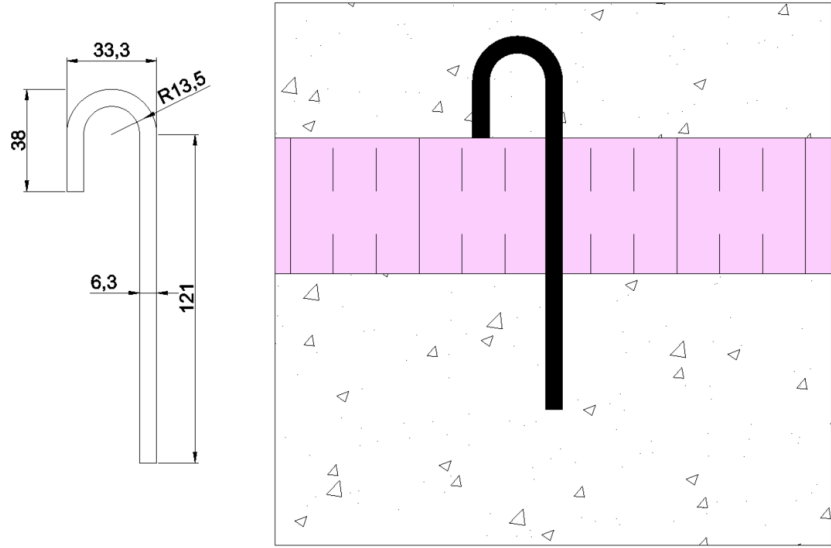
Shear Tie Details and Installation Schematics for NCTS-R Repair
